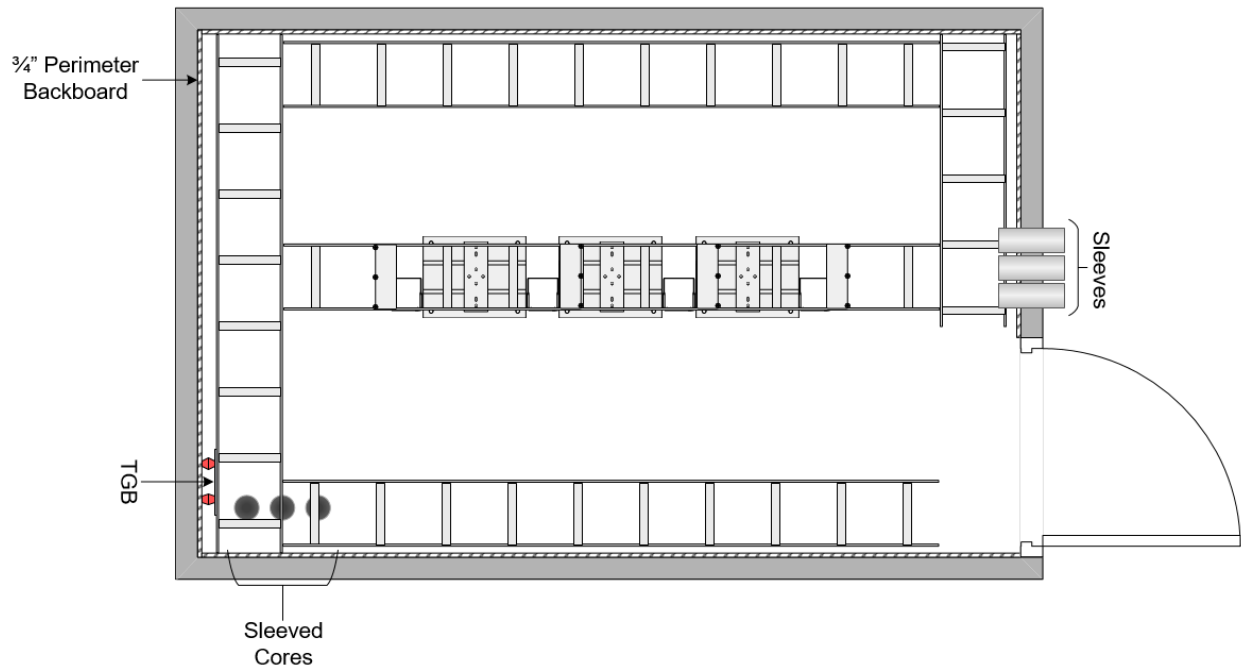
Typical example of telecommunications room floorplan showing equipment racks and overhead ladder pathways.
